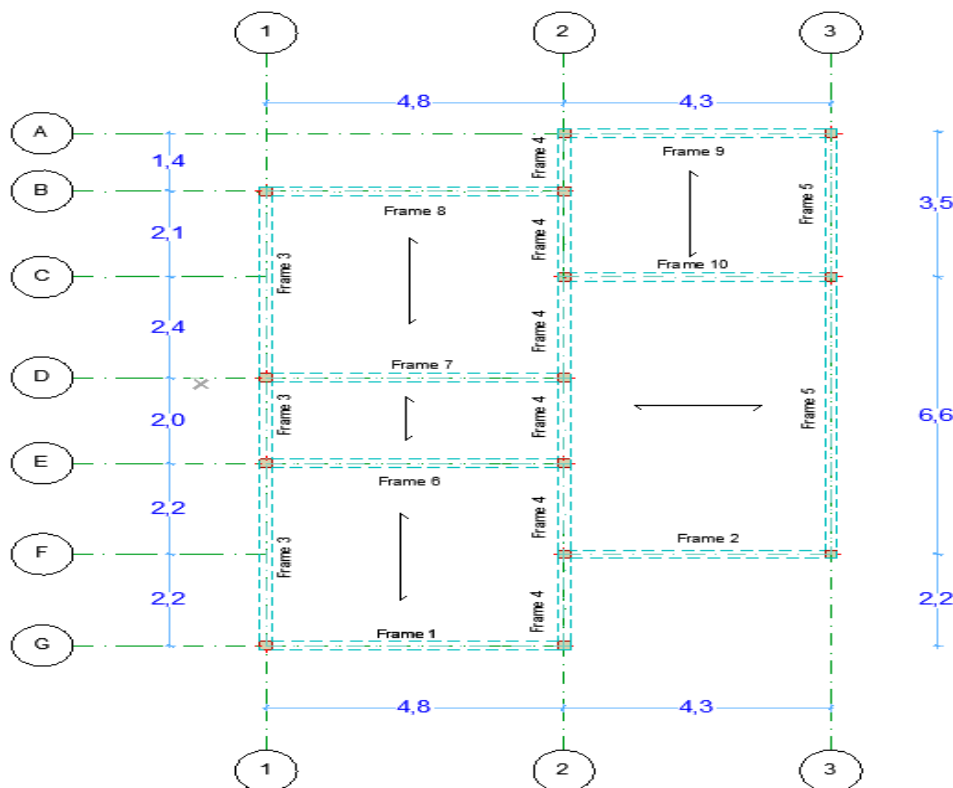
The Plan Consists of a TCC Slab, Timber Beams (Frames), and Columns
